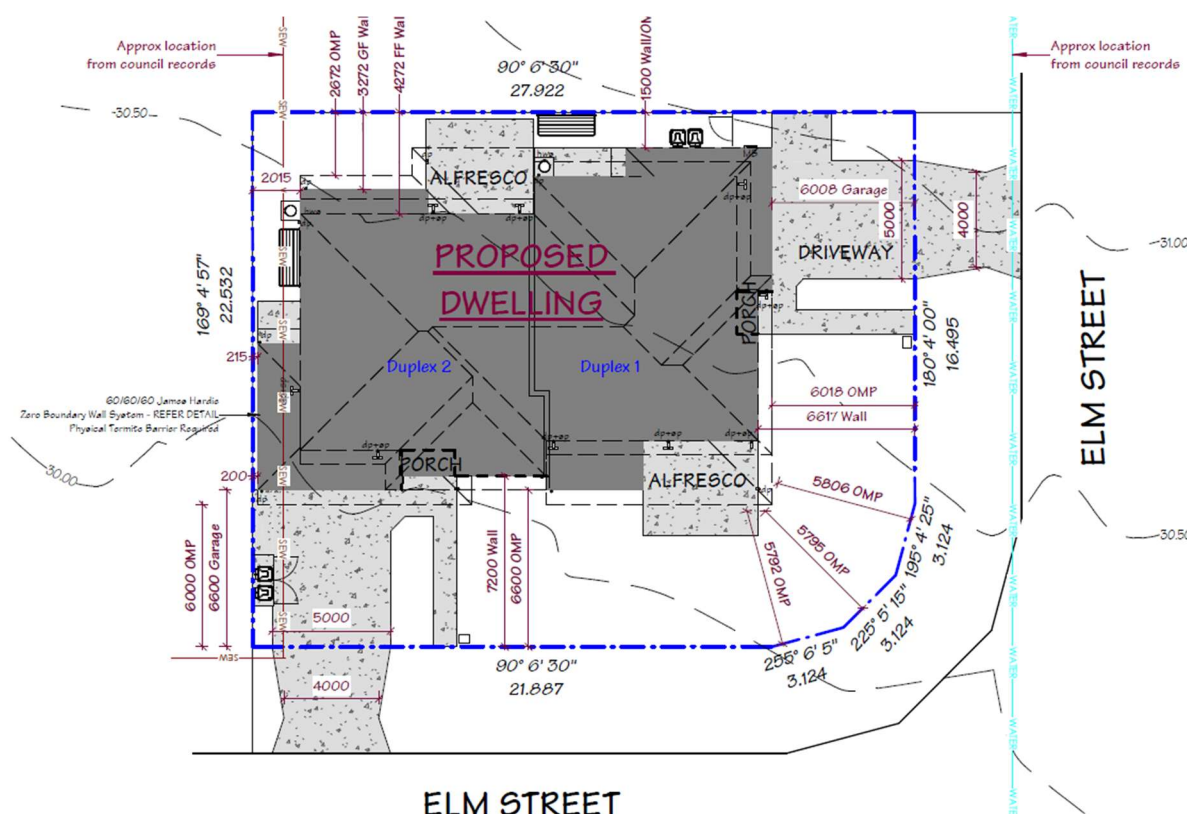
Proposed Site Plan (Source: ReziCAD Building Design)
